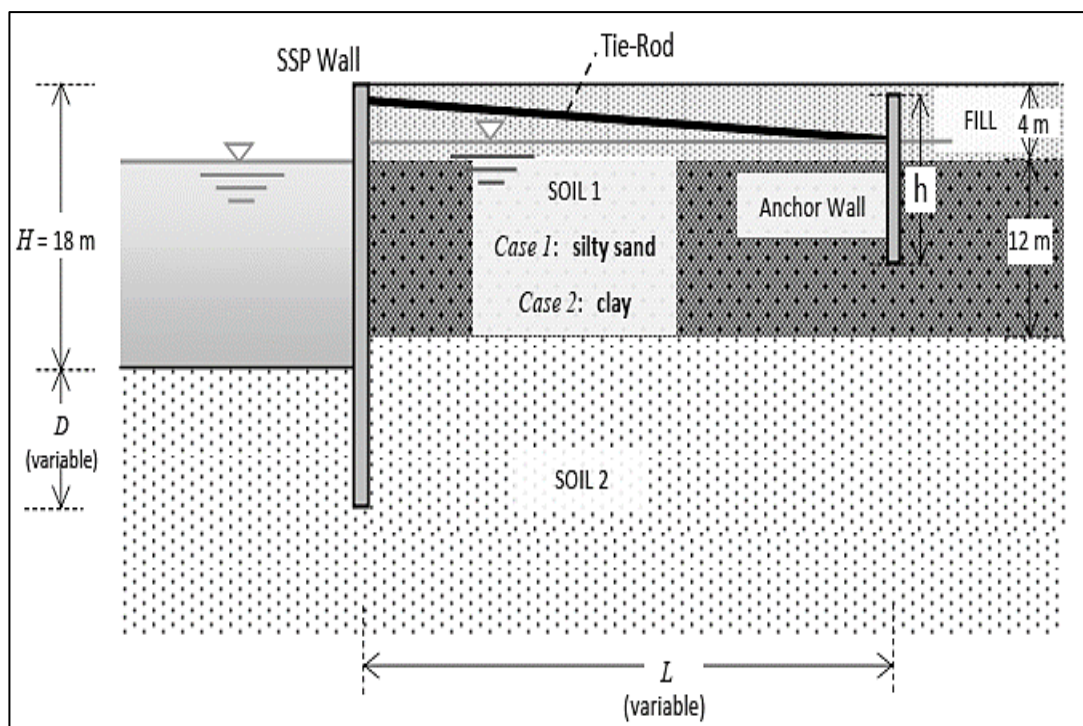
Example Sheet-Pile Wall System Used in the Study.[86]
